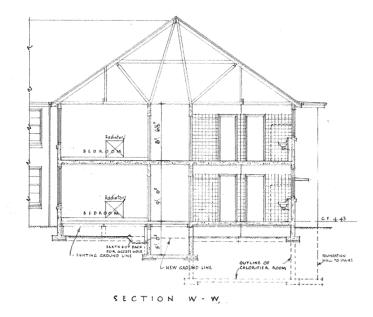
1955 Construction – Typical Transverse Building Section
